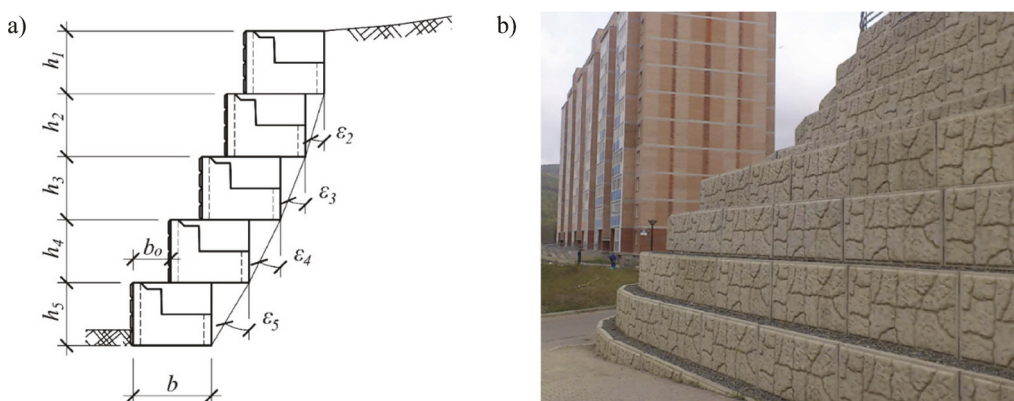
Retaining wall: a – infilled block layout scheme; b – retaining wall comprised of infilled blocks with height of up to 9 m (Vladivostok, Russia).
